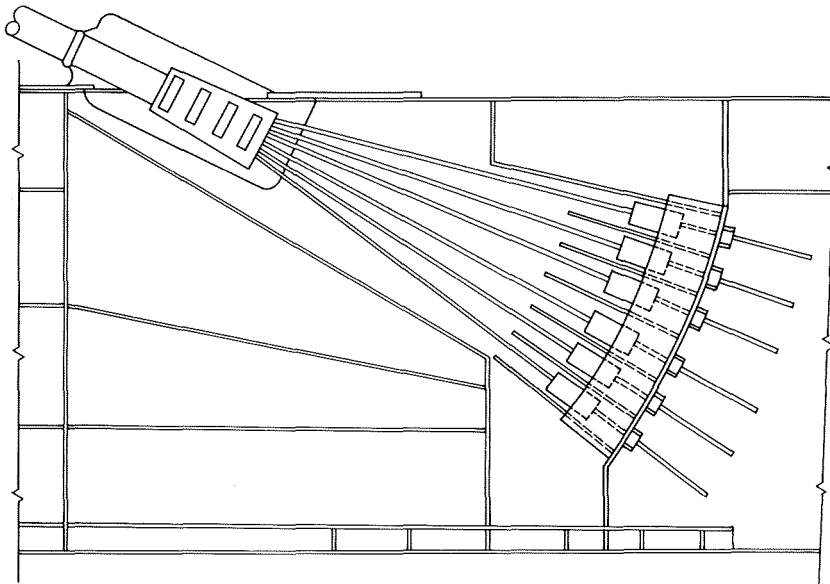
Strömsund Bridge, girder connection. (Courtesy of Der Stahlbau, from reference 20.)
